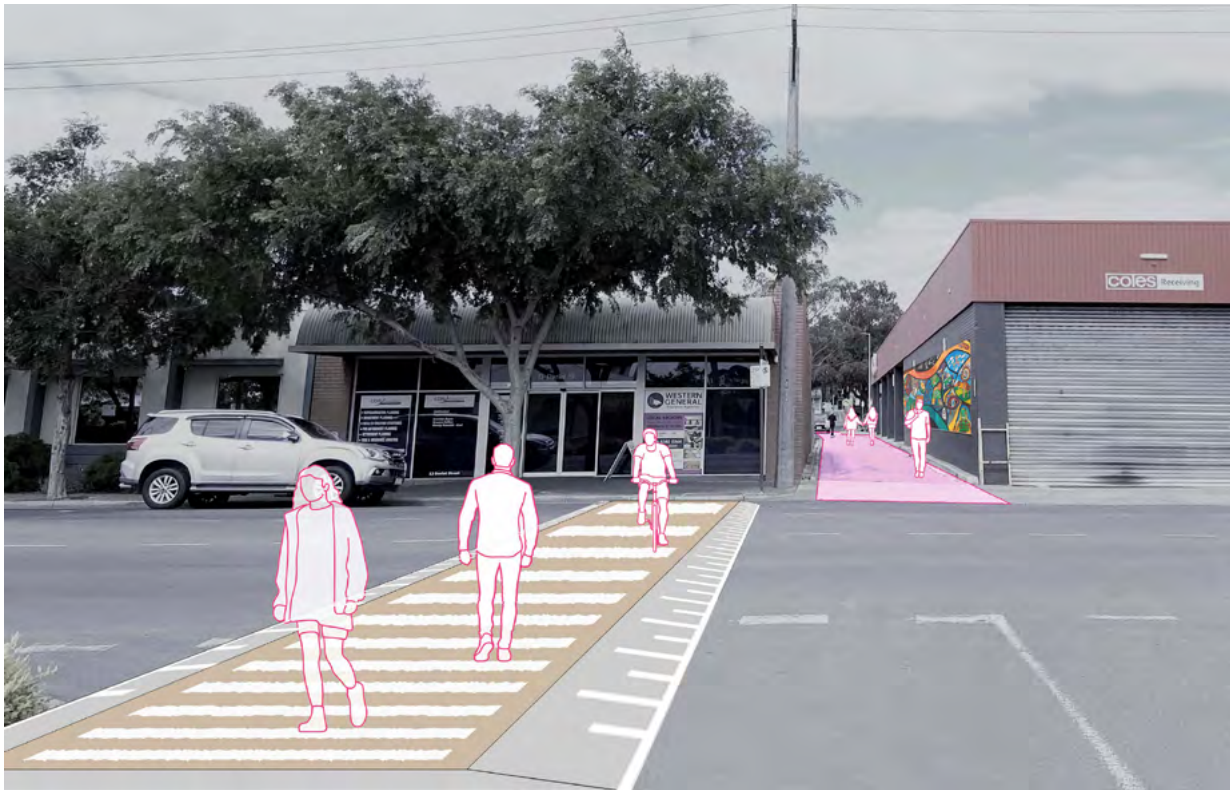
Add a crossing point on Darlot Street to Glead Street to better connect to both the laneway network and the recreational facilities on the western edge of the CAD.
